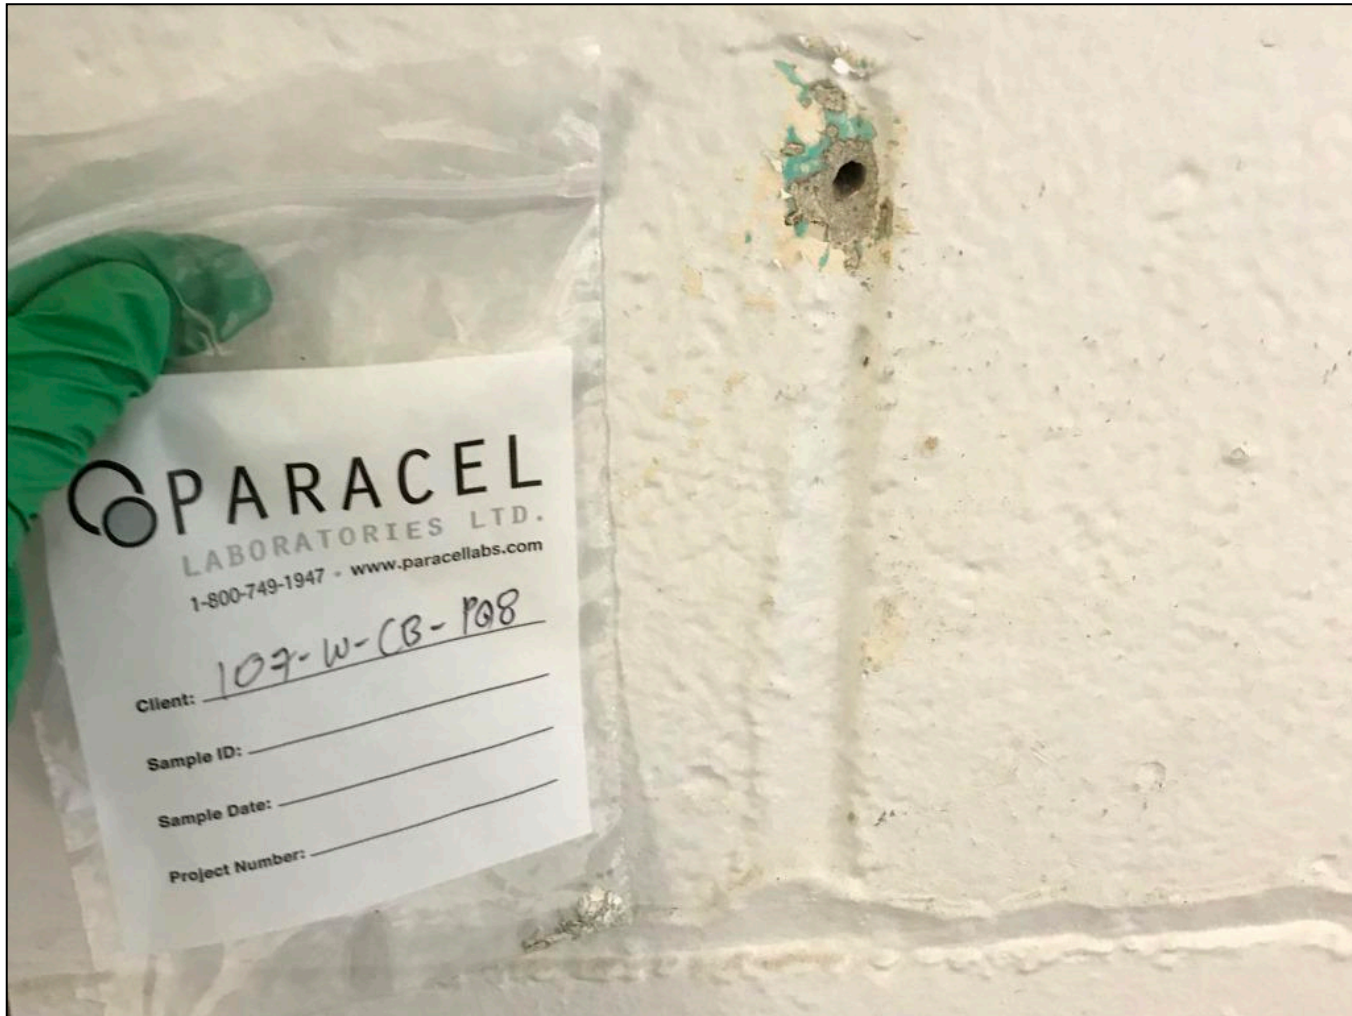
Main Floor, Room 107 – White, Beige, Green, Brown
